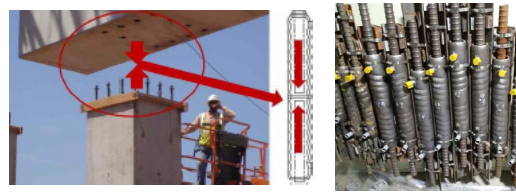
Vertical connection using splice sleeve of precast concrete segment
